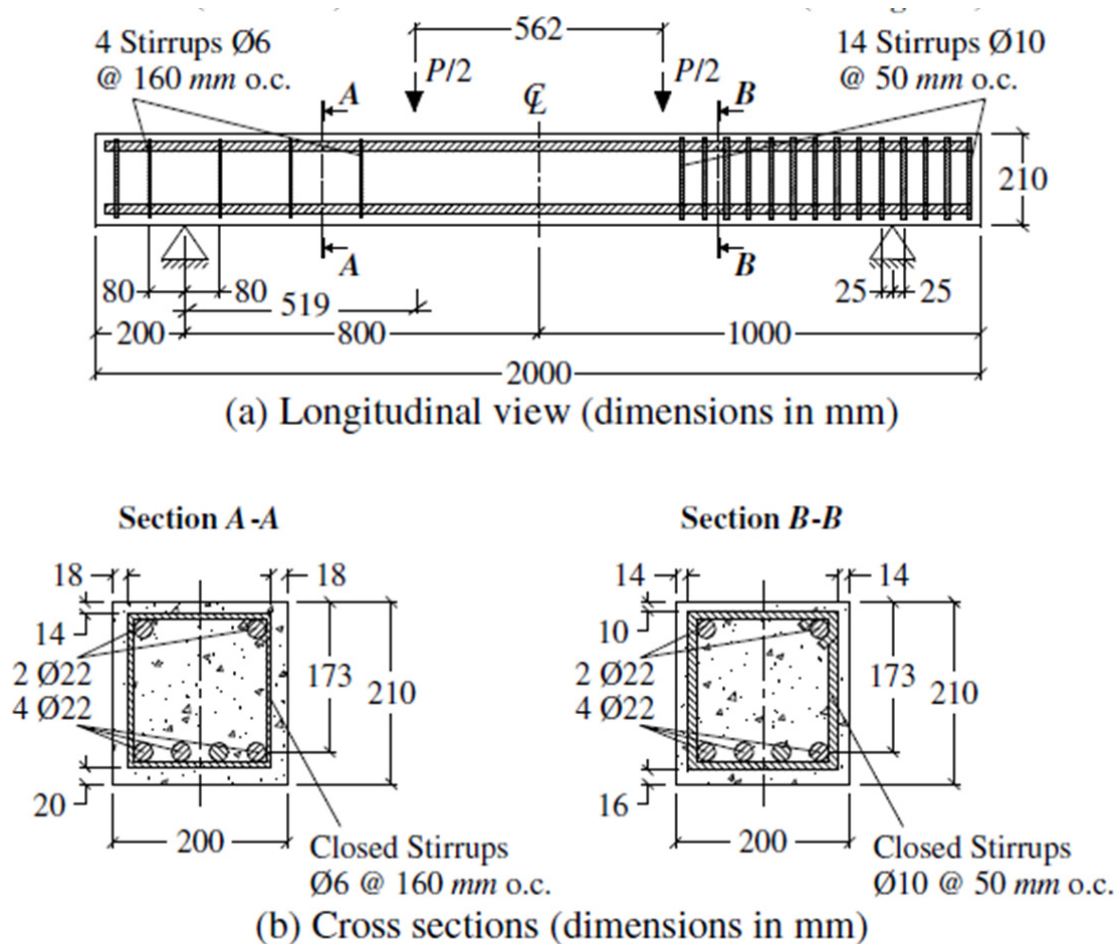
Geometrical details of the RC beams (Rizzo and De Lorenzis 2009)
